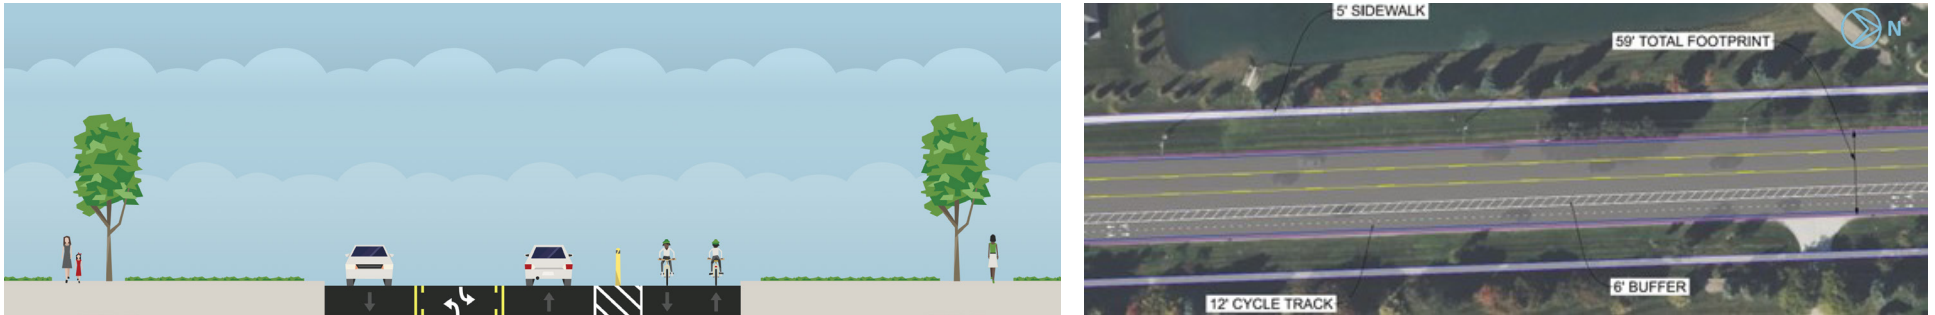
Alternative 1 Typical Cross-Section and Aerial View
